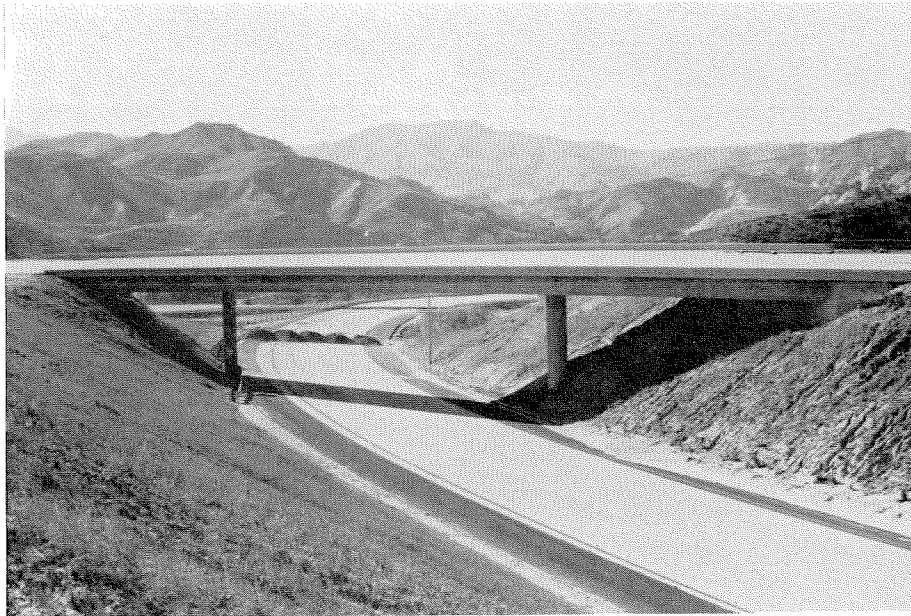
38 North connector undercrossing, Golden State-Foothill freeway interchange. Bridge suffered only minor damage at abutment backfill.
